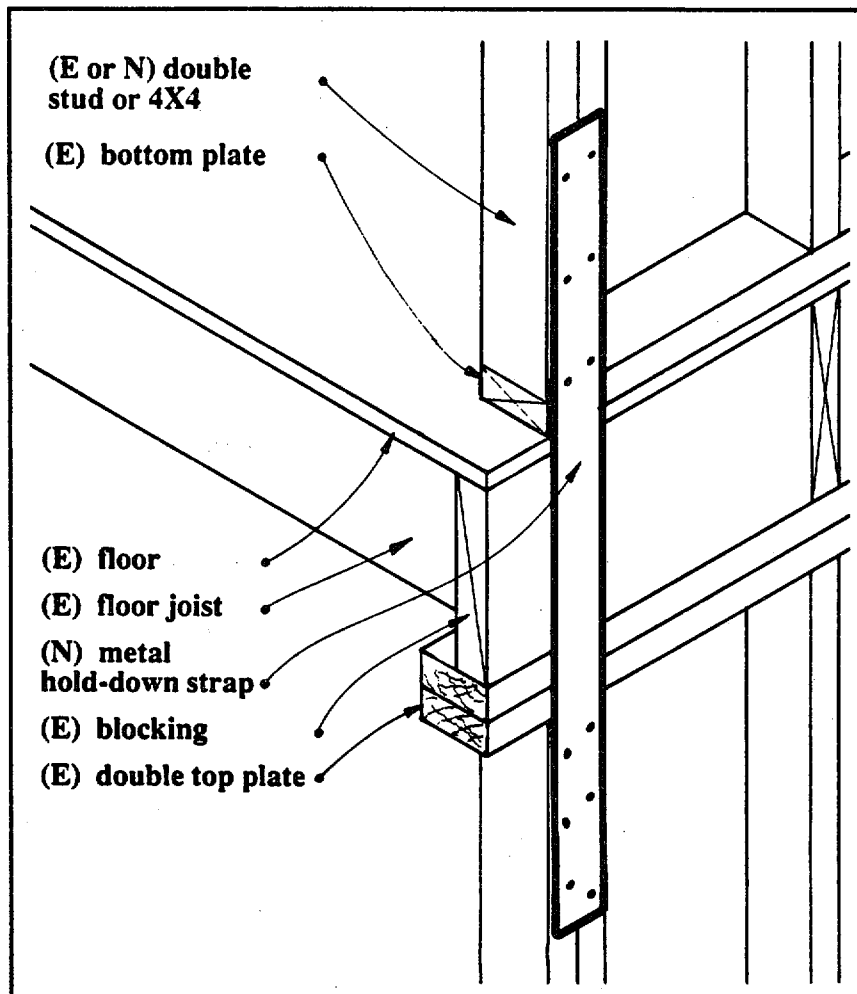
Strengthening the connection between shear walls using a metal strap.
